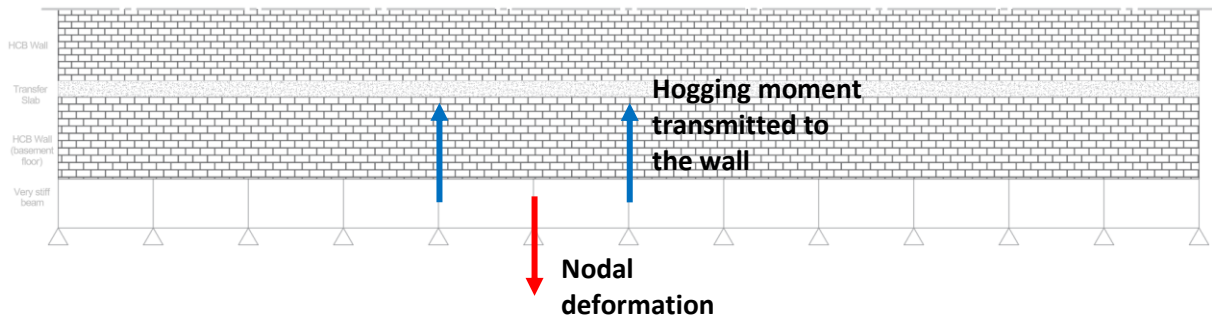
61 - Beam supporting the long-span masonry wall divided in shorter segments
